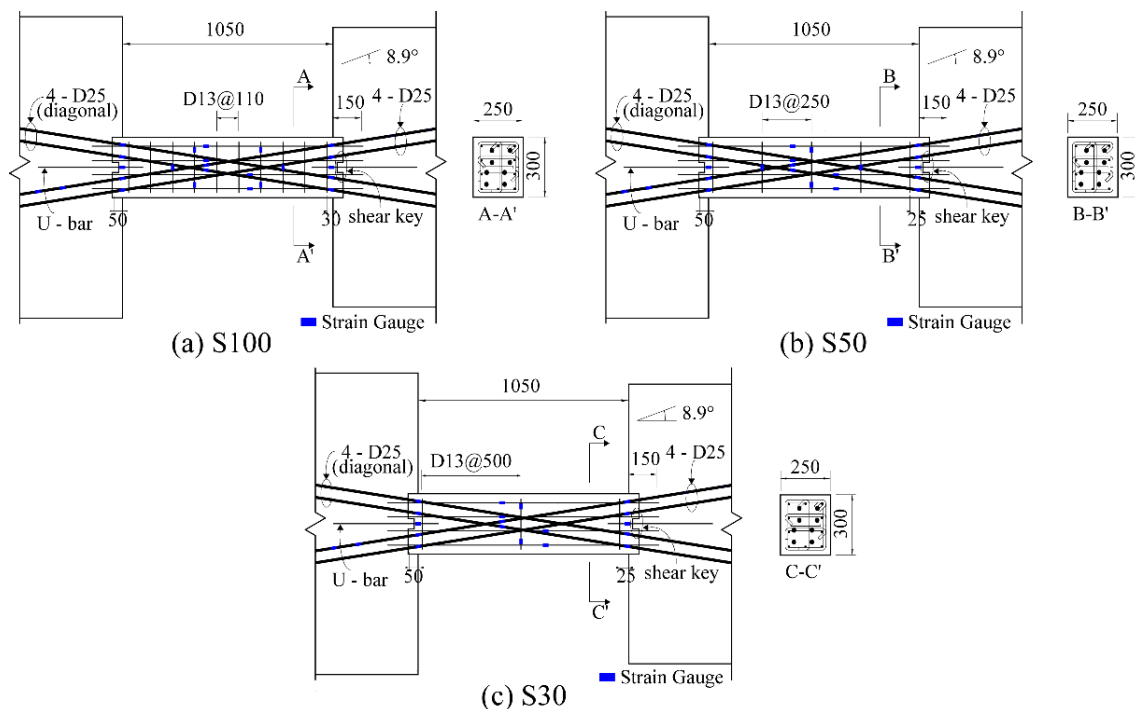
Reinforcement details and strain gauge layout for the specimens
